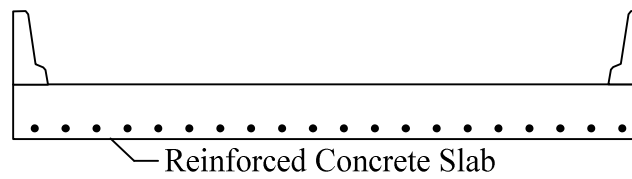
REINFORCED CONCRETE SLAB
